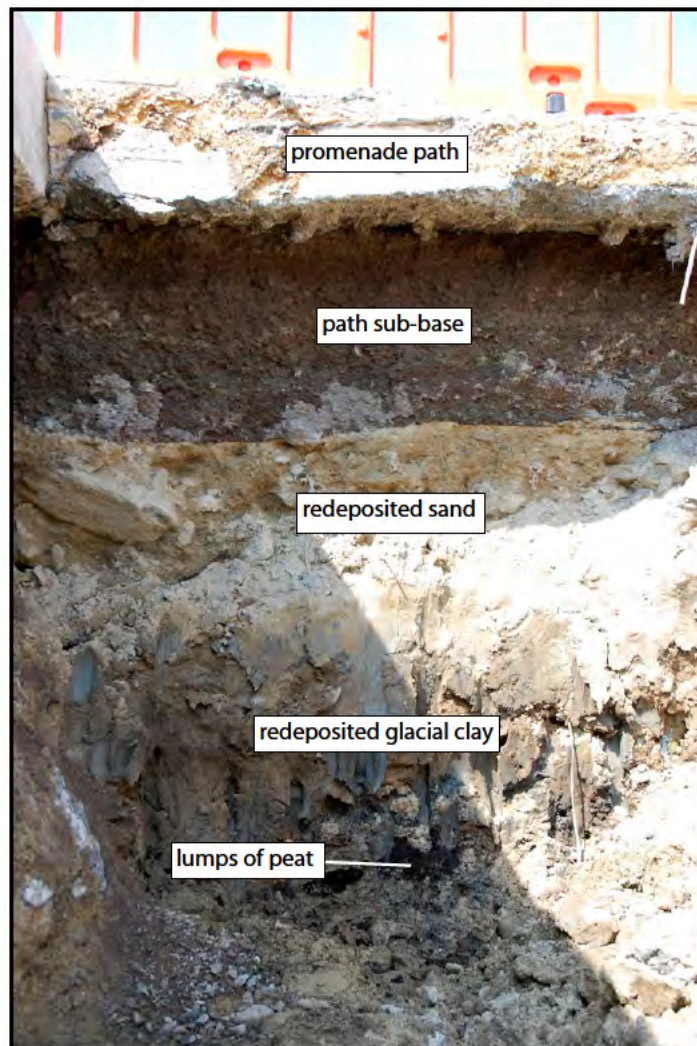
south facing section within a promenade bay detailing full excavation depth; this example contained a series of deposits associated with backfilling following recent repair work; note the redeposited sand, glacial clay and lumps of peat (provenance unknown); the majority of the excavated bays contained thick deposits of sand only
